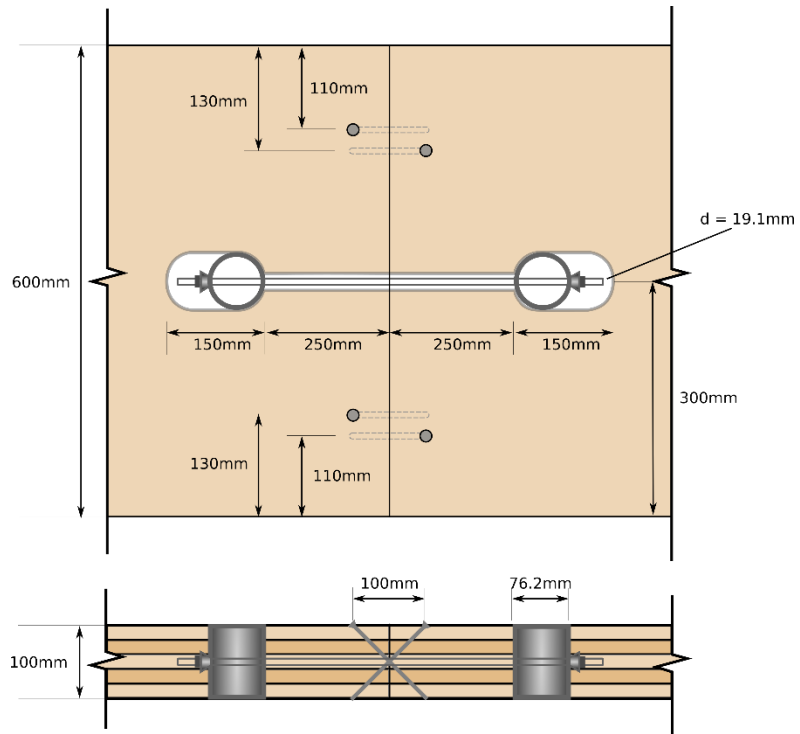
6 Tube connection design (installed alongside regular butt joint)
